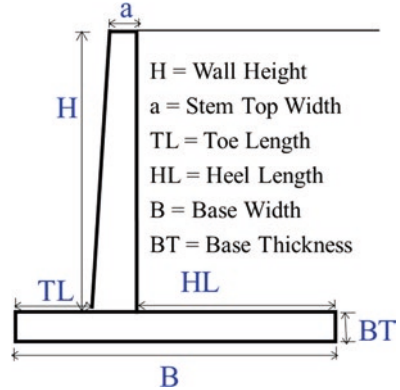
Typical dimensions of cantilever retaining wall (After Bowles 1996)
